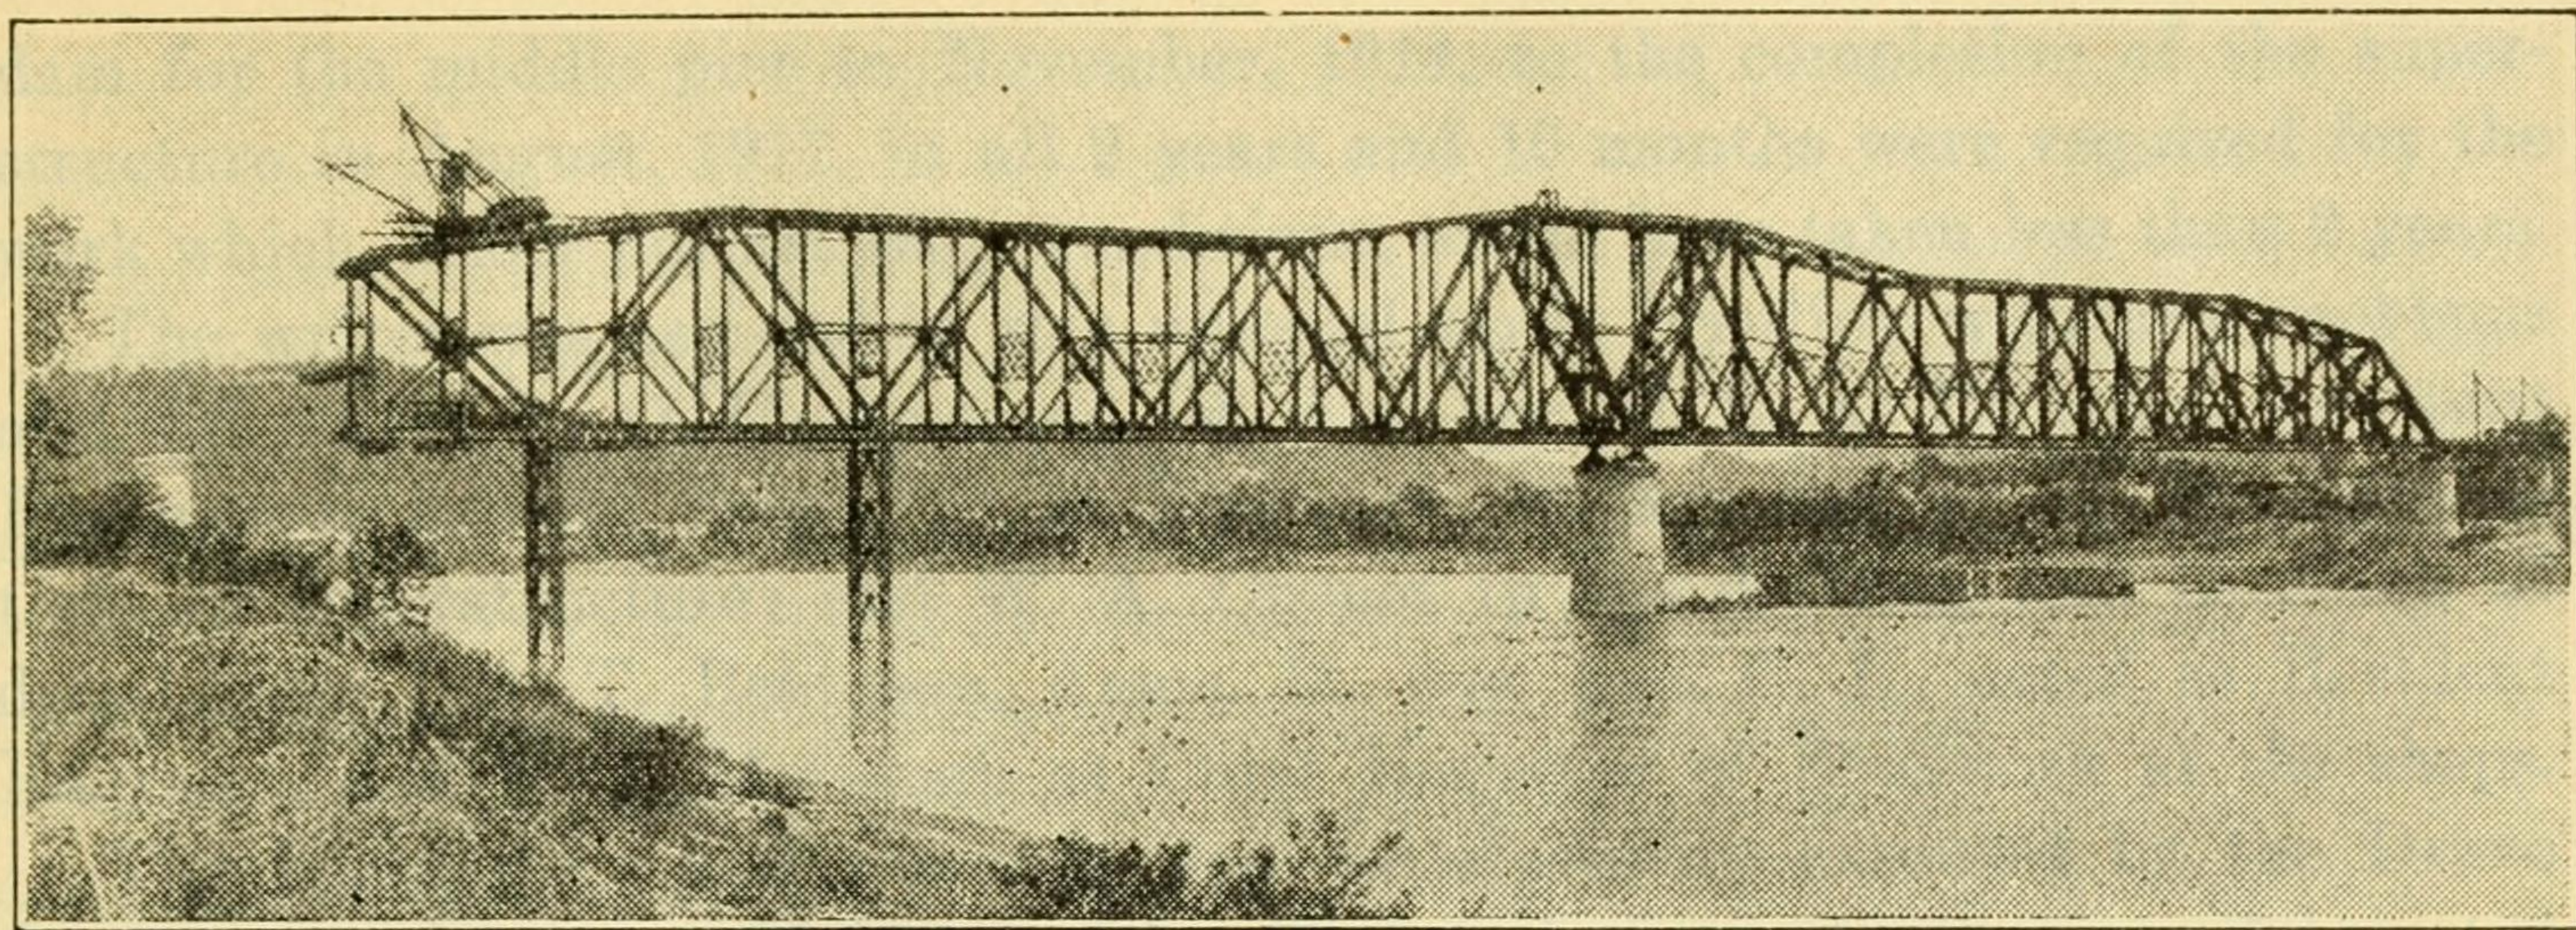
CANTILEVER SECTION, KENTUCKY SPAN, SCIOTOVILLE BRIDGE.
